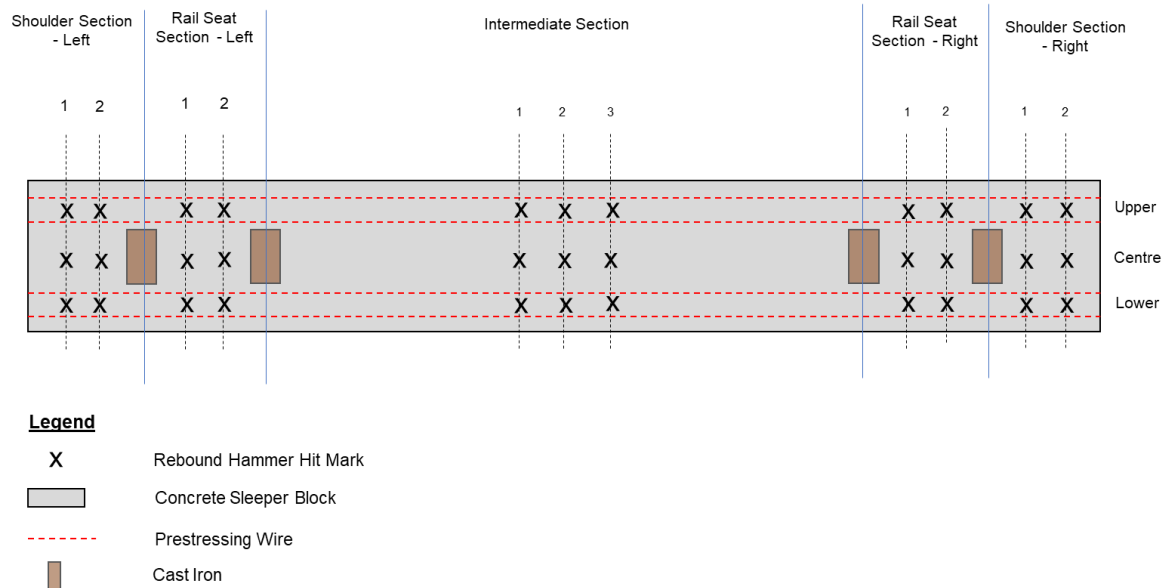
Schematic concrete outline indicating the locations of concrete hammer impacts
